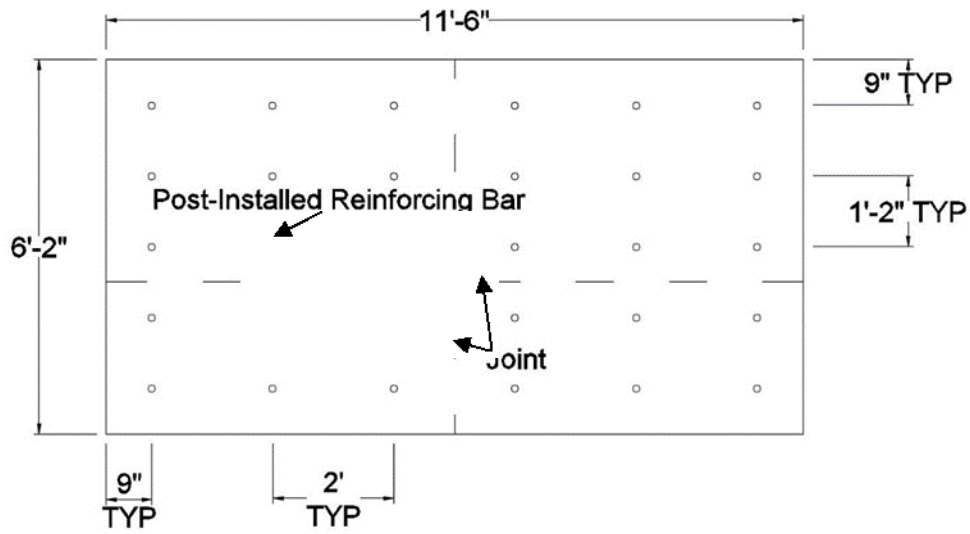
Slab dimensions, control joint locations, and spacing of post-installed reinforcing bars away from slab edges
